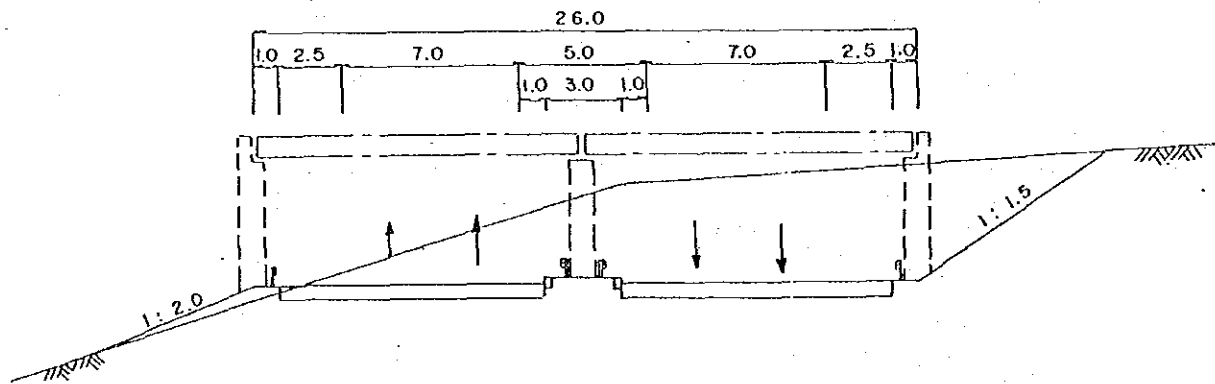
Full 4 Lane Typical Cross Section
